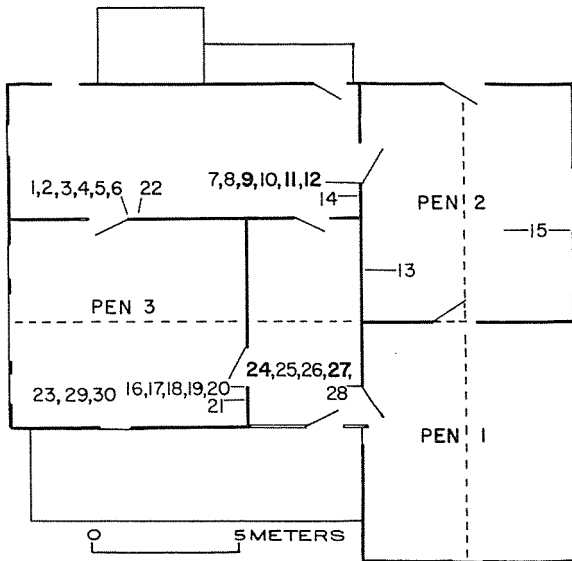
Plan of the building at 209 West First Avenue, Corsicana, showing the two original log structures (heavy lines) and subsequent additions (fine lines). Note the large doorway, later filled in by framing, that was originally between pens 1 and 2 of the double-pen structure. Plain numbers indicate sample locations; bold-face numbers indicate dated specimens (see Table 1).
